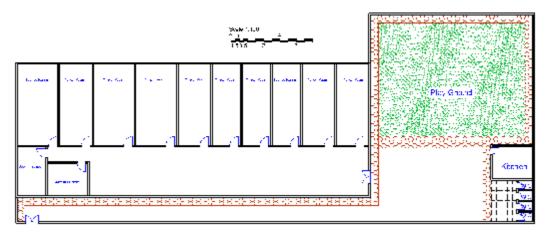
Floor plan of Zlitin B Kindergarten (Drawn by author)
